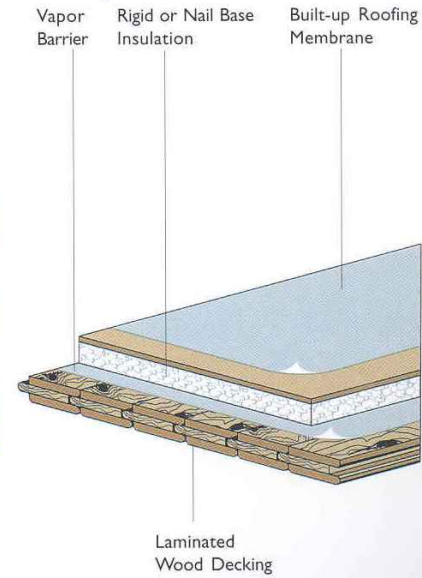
LAMINATED ROOF DECKING (RIGIDPLY RAFTERS)
